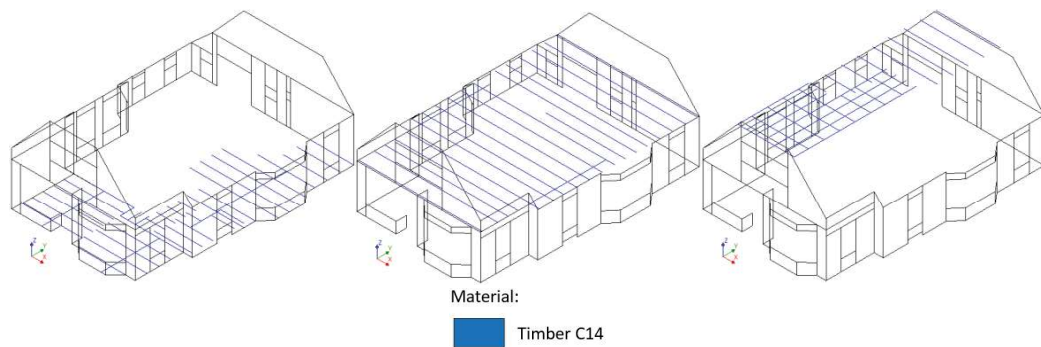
Floor timber beams. Ground (left), first (middle) and attic (right) floor. South-West view.
